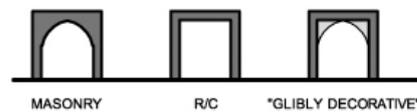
The difference between semi open spaces of masonry and reinforced concrete construction.
